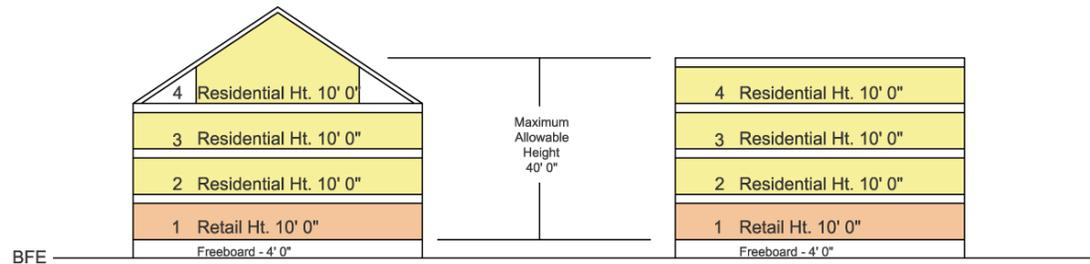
Retail height cramped for meaningful retail that can activate the ground floor
